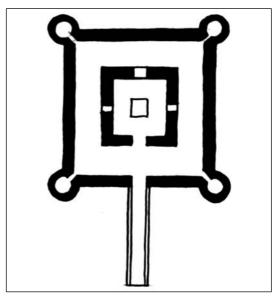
Ustrushana. Temple of fire in Aktepa. Reconstruction of plan, 7th century.
